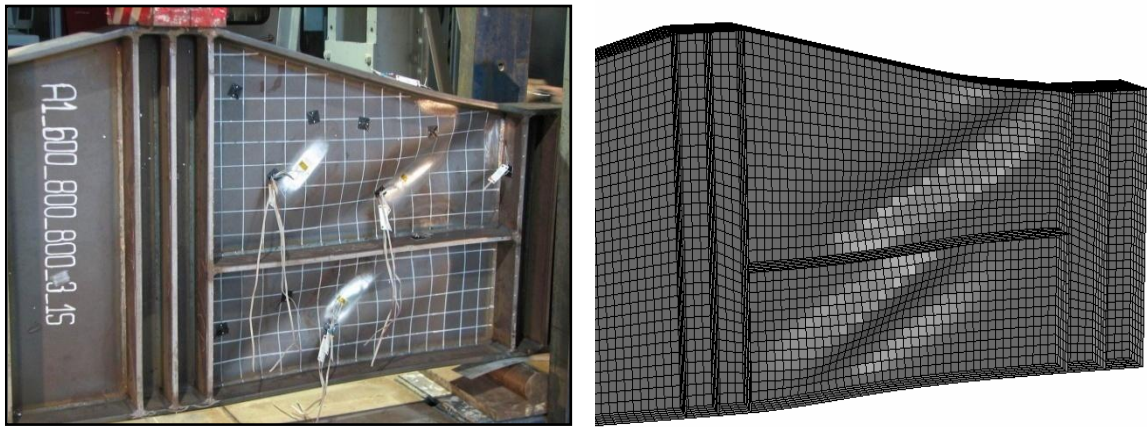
Comparison of deformed shape for girder A1: a) experimental test b) numerical model.
